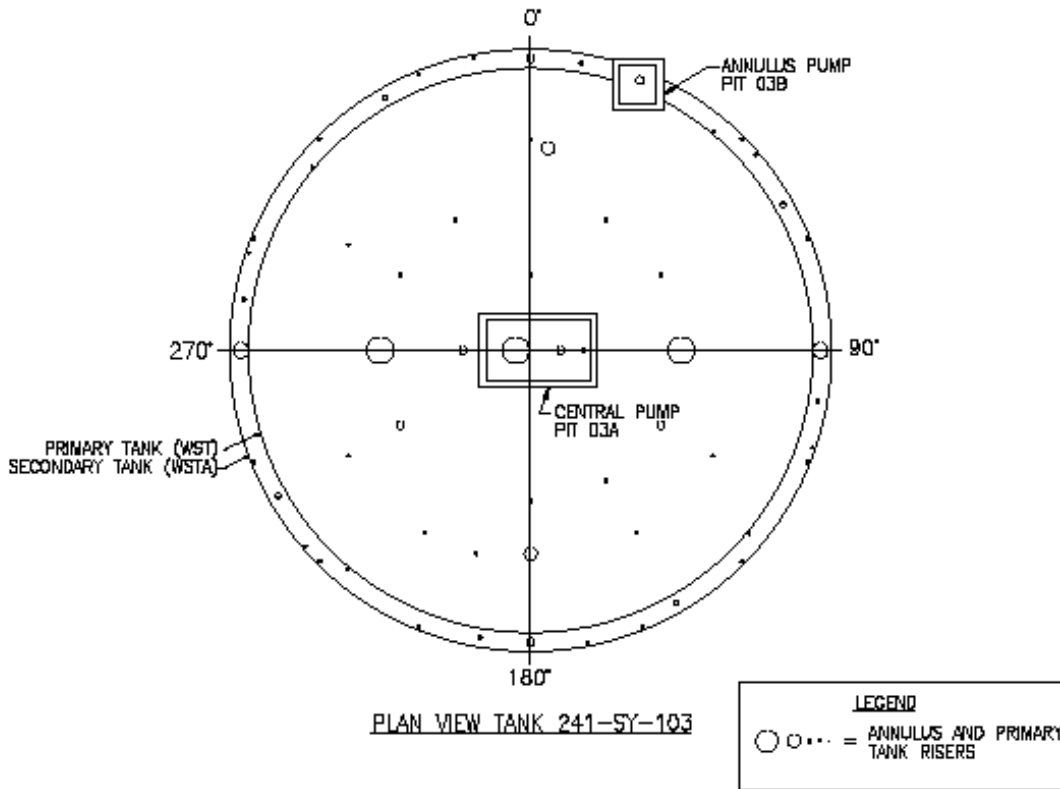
Plan View Double-Shell Tank 241-SY-103
